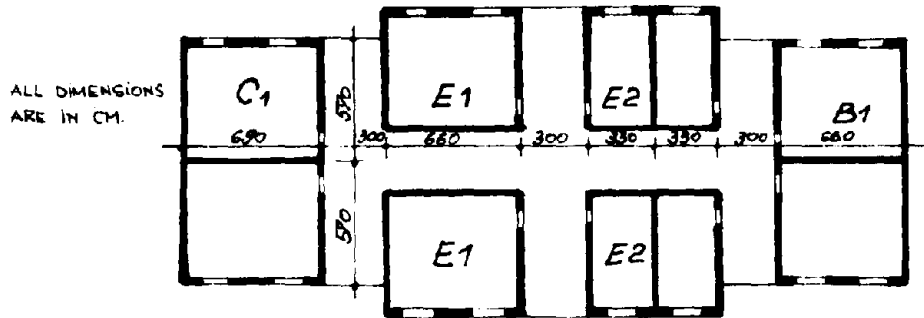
TYPICAL FLOOR PLAN OF NINE STORY LARGE PANEL STRUCTURE.
